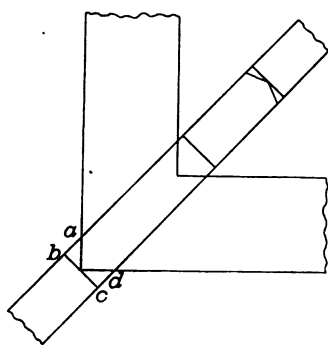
Fig. A Is Plan of Plates at Corner of Building Showing Seat of Hips
